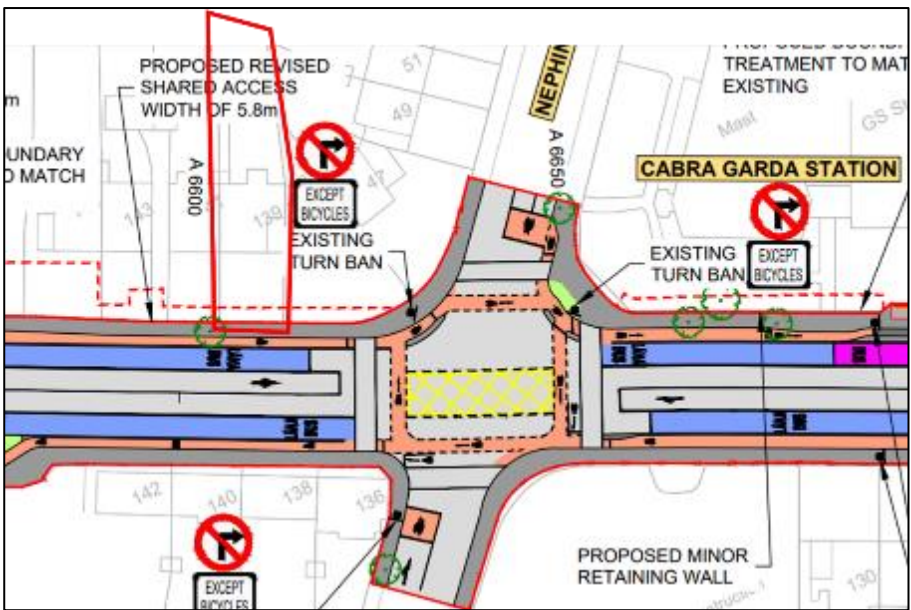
Proposed new Layout at 139 Navan Road
